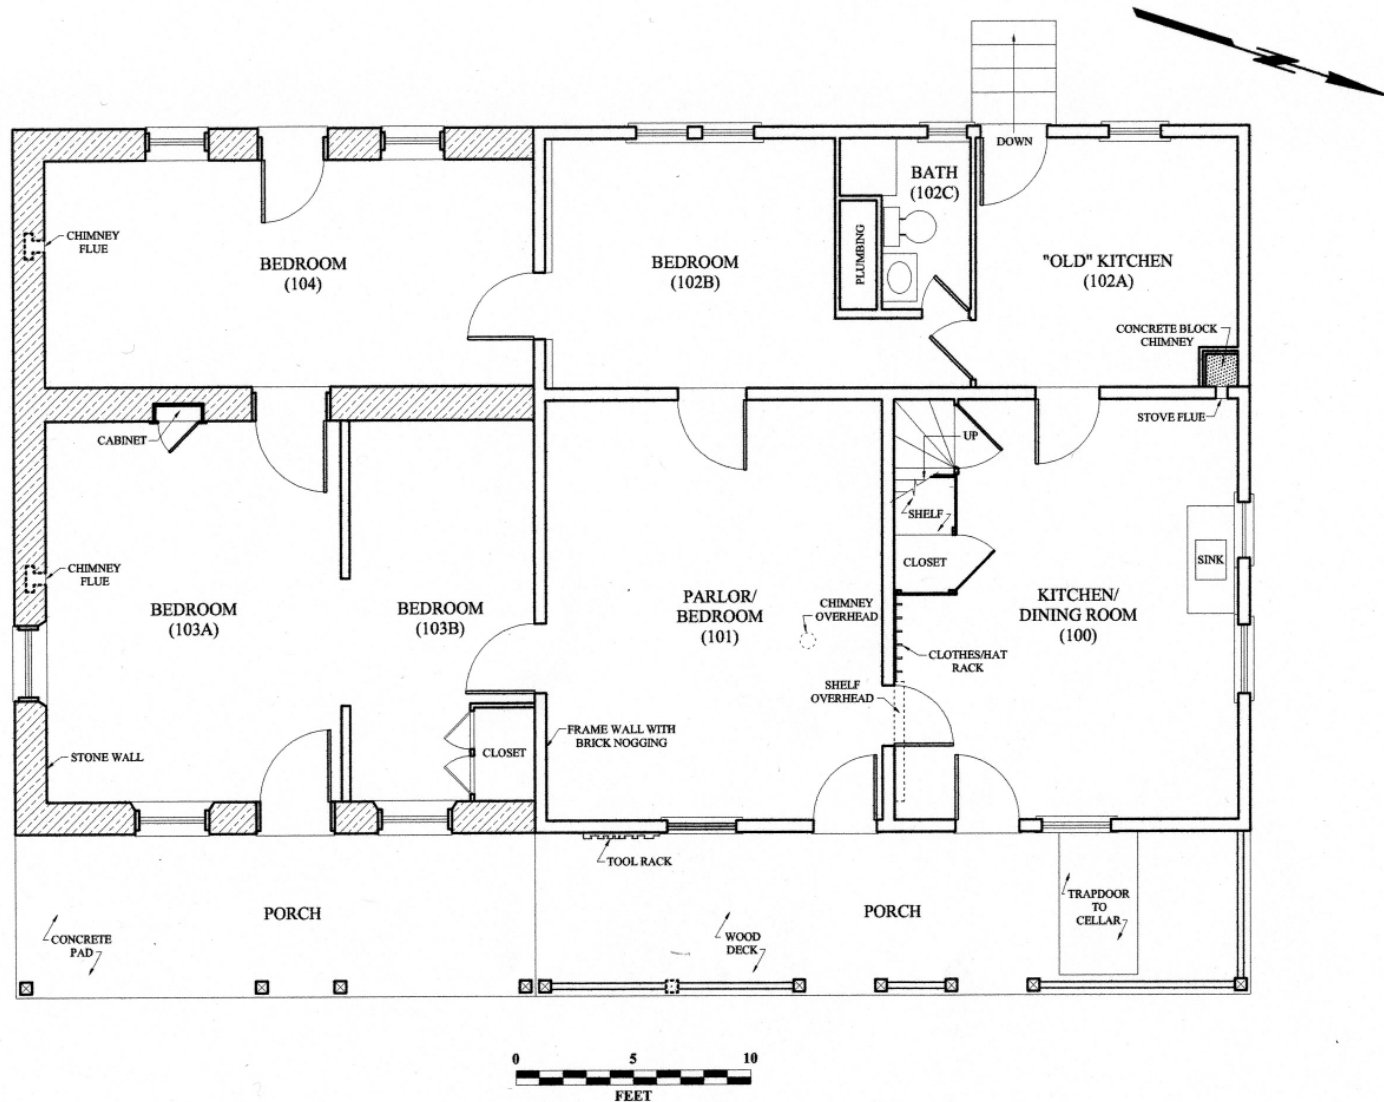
First floor plan of the house showing conditions circa 1955. By this date, Rooms 102 and 103 had been partitioned up into multiple rooms. This plan also reflects existing conditions at the house.
